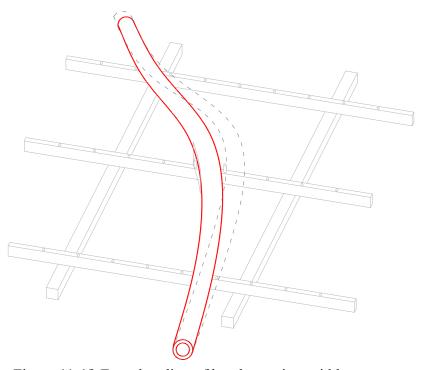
Extra bending of bamboo using grid layout to account for spring back
